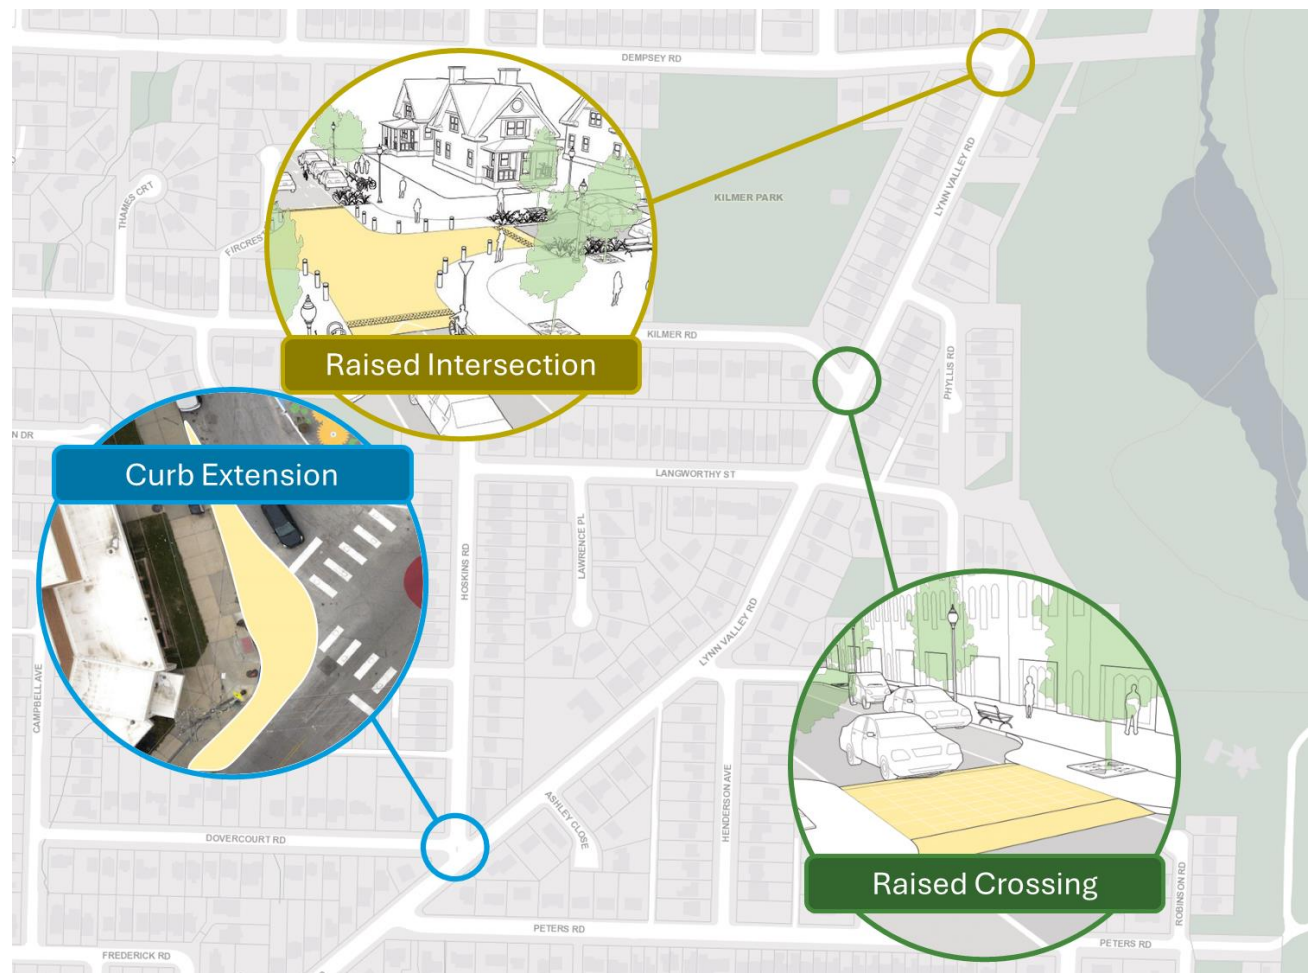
Location and concepts of proposed intersection improvements on LVR north of Peters Road
